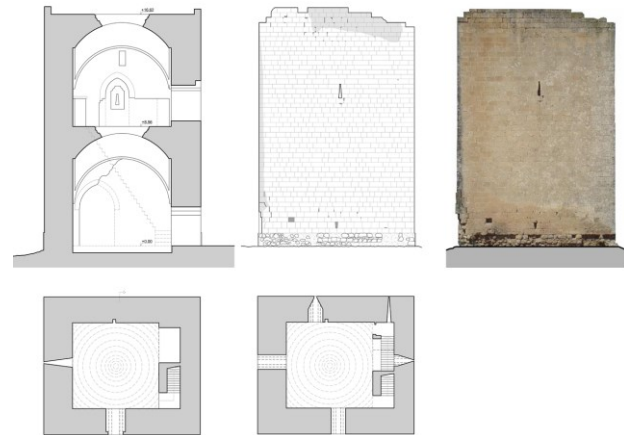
Torre Lopera in Montellano, Seville. Floor plans. Section and photogrammetric elevation.
